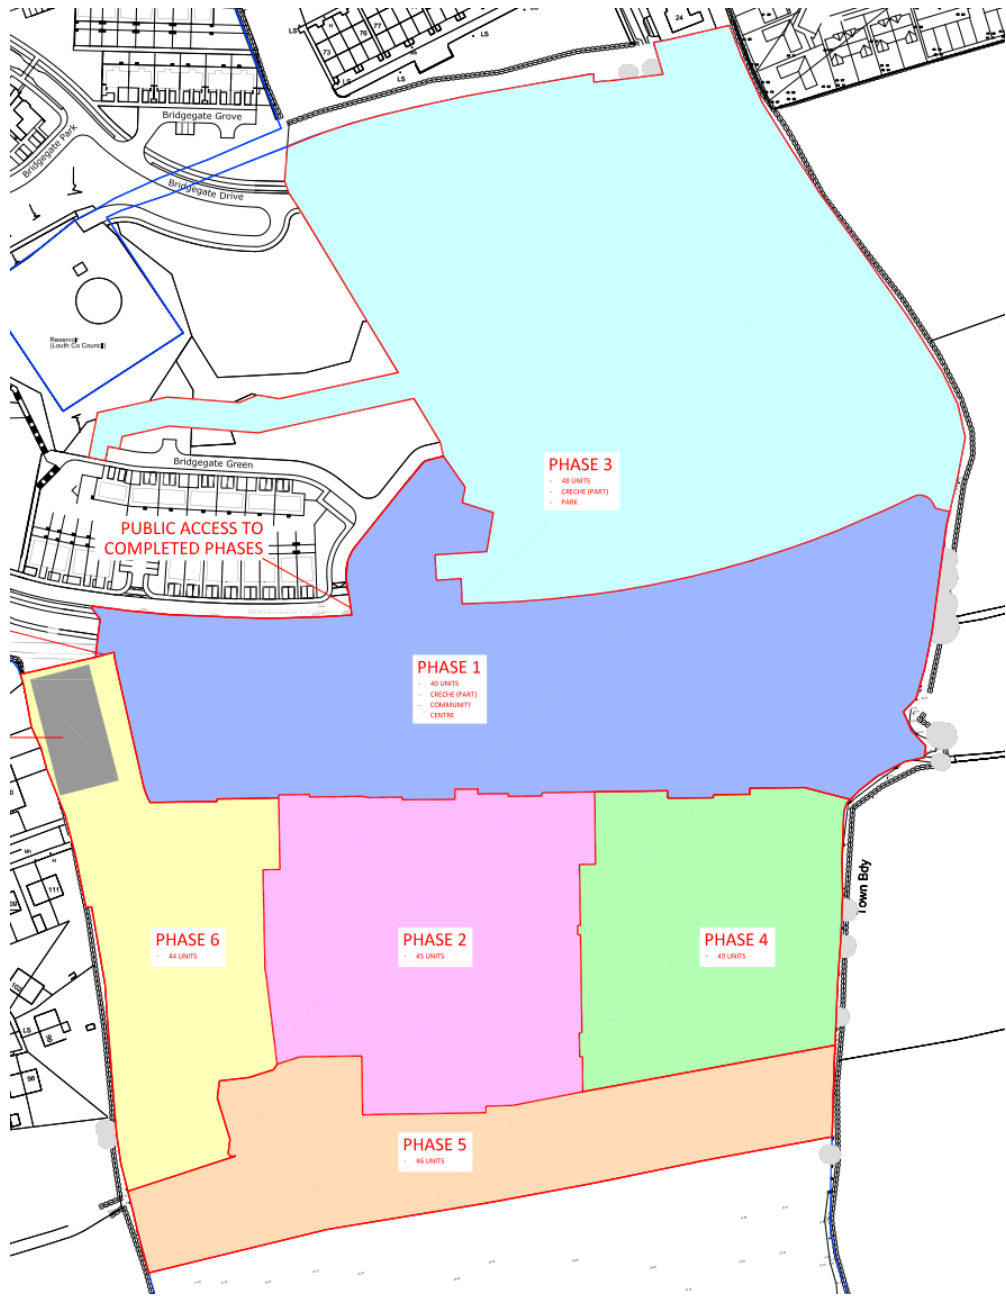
Proposed Site Phasing Plan (Darmody Architects).
